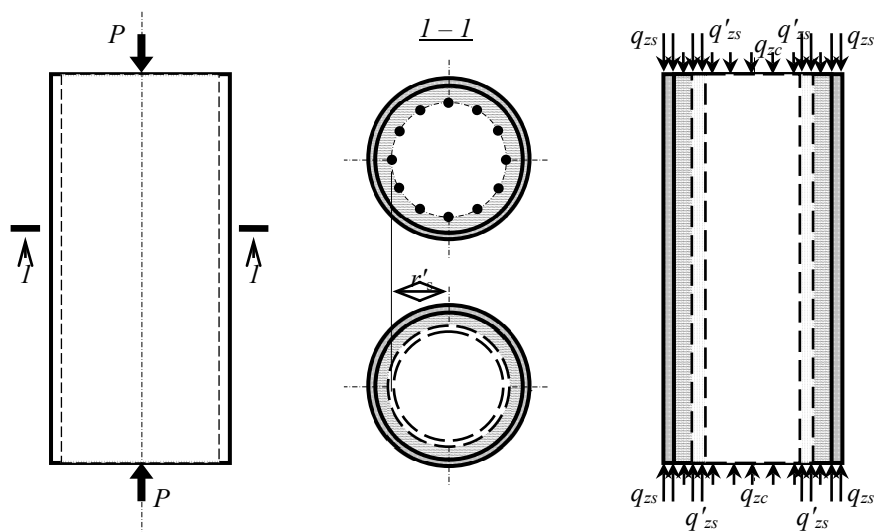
Design diagram of tube confined concrete element with core of the high-strength concrete reinforced with longitudinal steel bars
